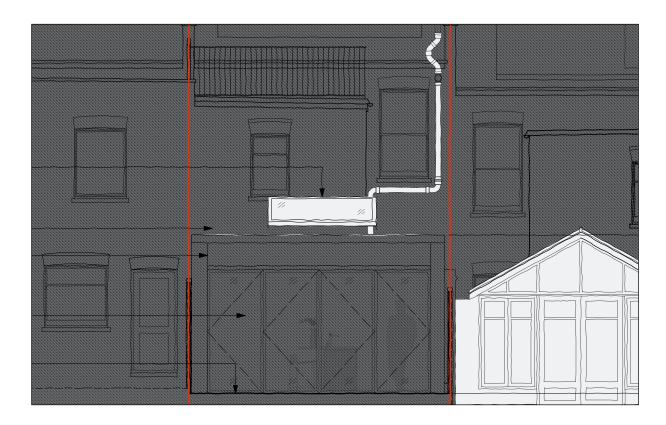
Proposed Elevation Rear Extension (not to scale) - 2019.
